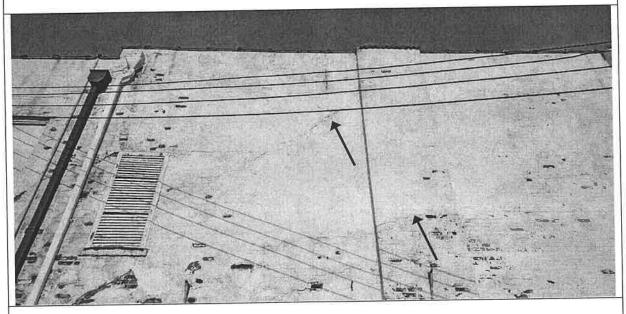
East Exterior Wall: Note significant structural diagonal cracks.
